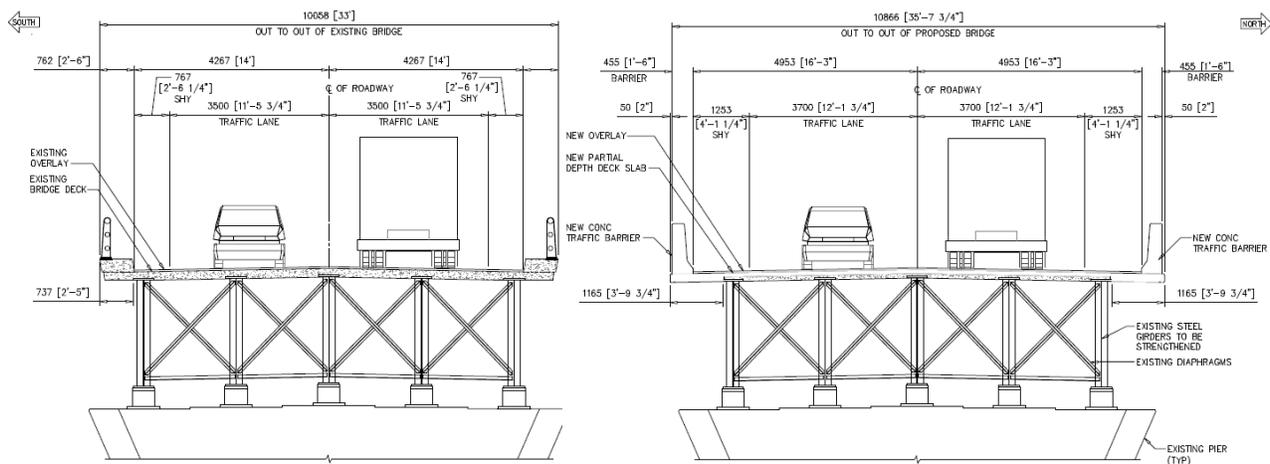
Original Bridge Cross-Section (Left) and Option 1 Bridge Cross-Section (Right)
